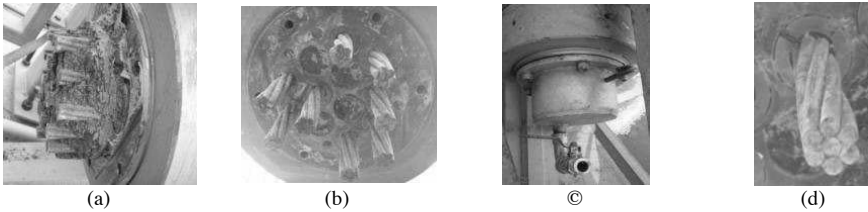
Stays bottom head (a) after the opening of the head, (b) after the cautious removal of the cement grout, (c) re-position of the cover with the special inlet of wax injection and (d) detail of strand and wedges
